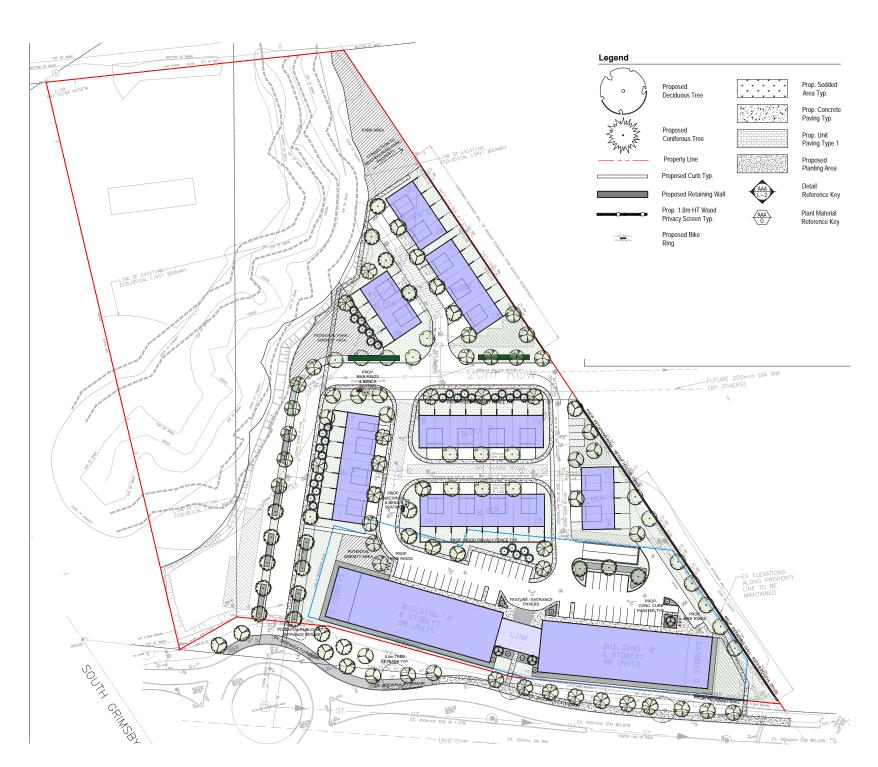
Proposed Landscape Concept. Courtesy of MSLA
